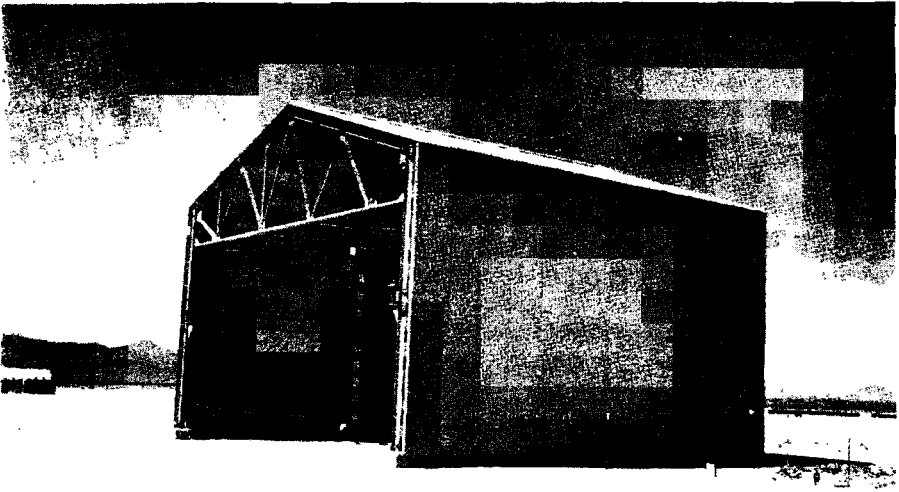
Steel-frame building with siding and roof of frangible material.
